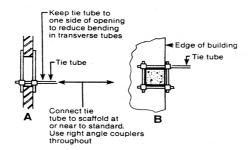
Box tie. A. Vertical or horizontal section through wall. B. Horizontal or vertical section through structural member.
